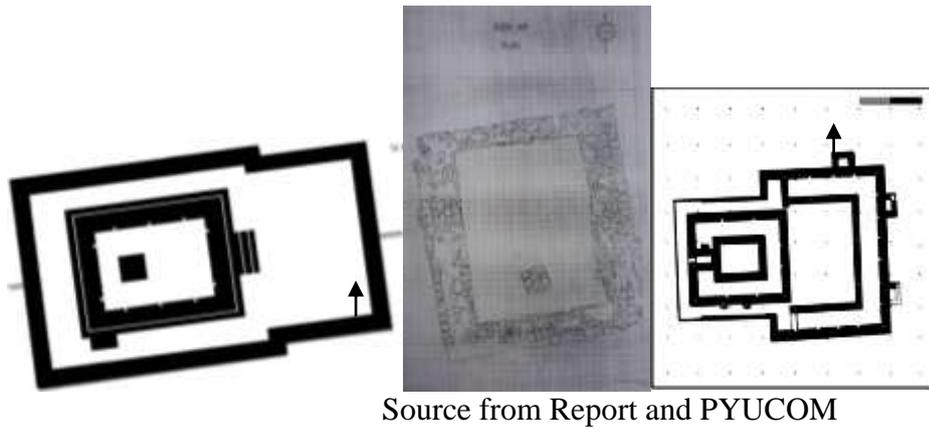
Site plan for rectangular shaped structures outside the eastern city wall
